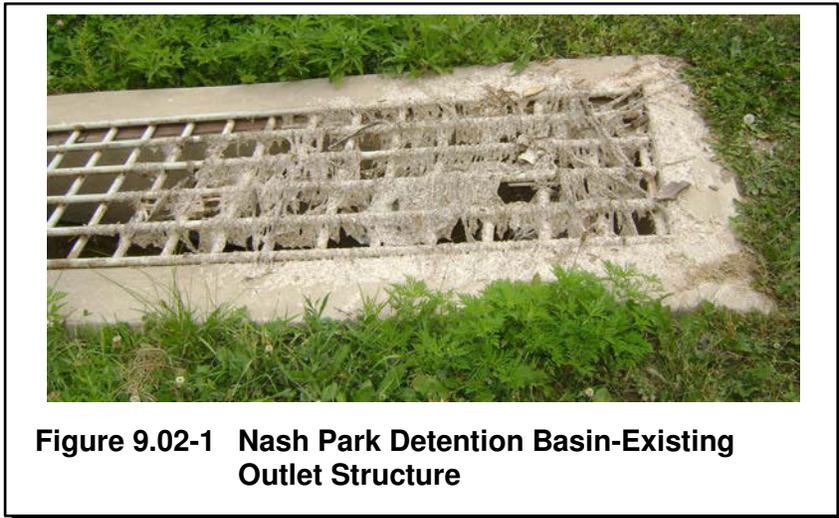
Nash Park Detention Basin-Existing Outlet Structure
